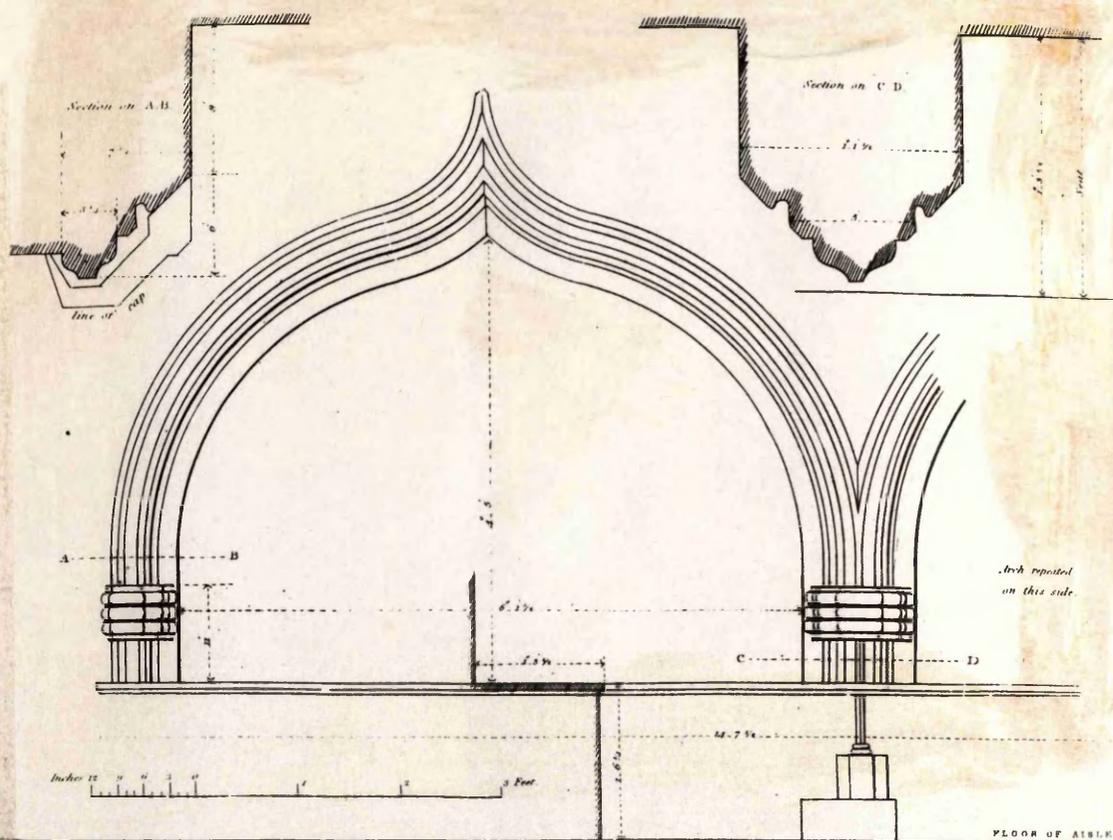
CATTERICK: north nave aisle recesses, elevation and sections.
